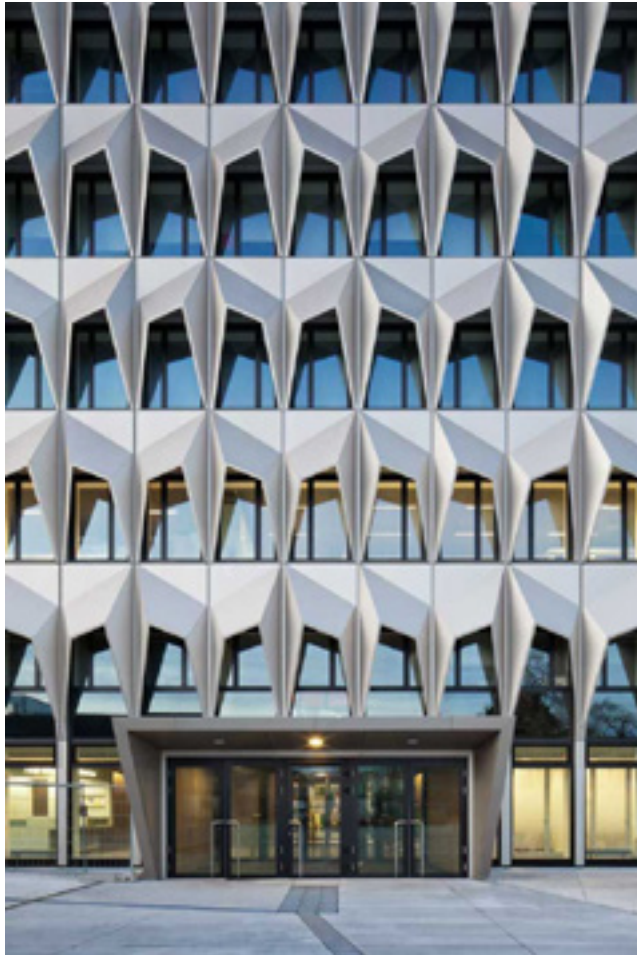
The C10 Tower with a new skin of aluminium curtain walling
